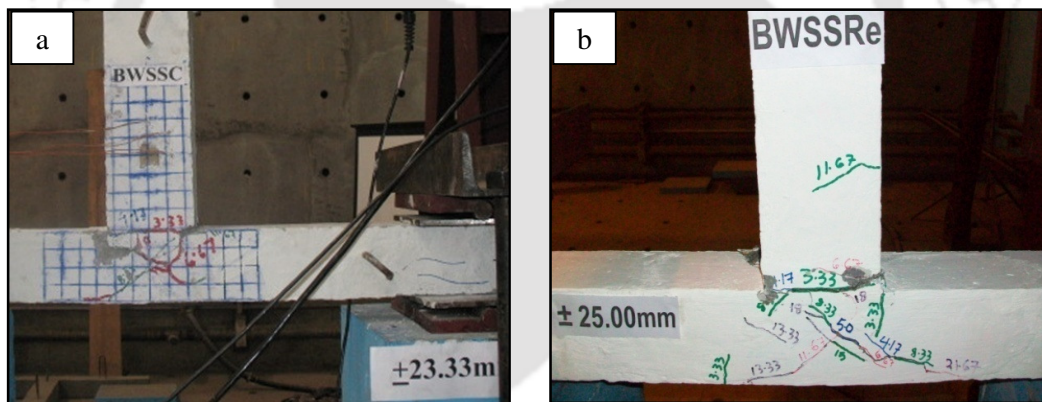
BWSS specimens at the end of test under loading type-1:
